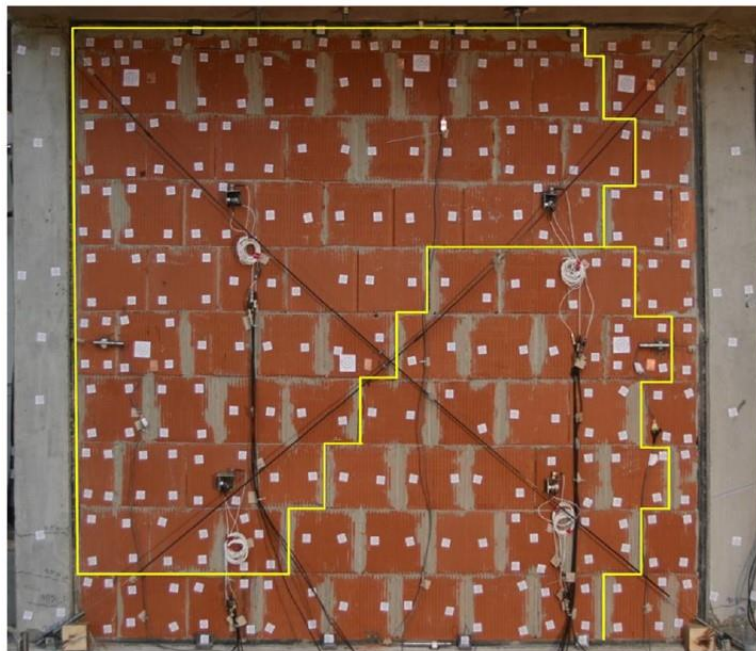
Crack pattern on the masonry Type C at the end of Phase 1.
